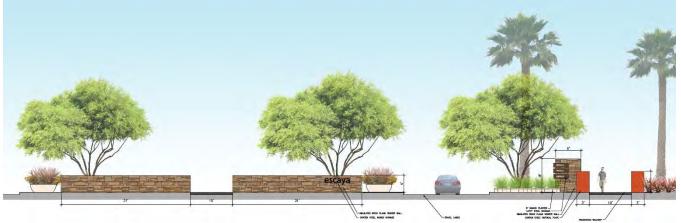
Primary Village Entry Concept Plan (Avenida Escaya @ Heritage Road)
